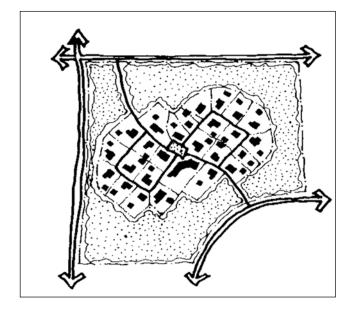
3-10: Appropriate Development Example—Buildable lots located within the interior of a development shall be set back from the Columbia Avenue right-of-way in accordance with Subsection 3.4.7(8).
